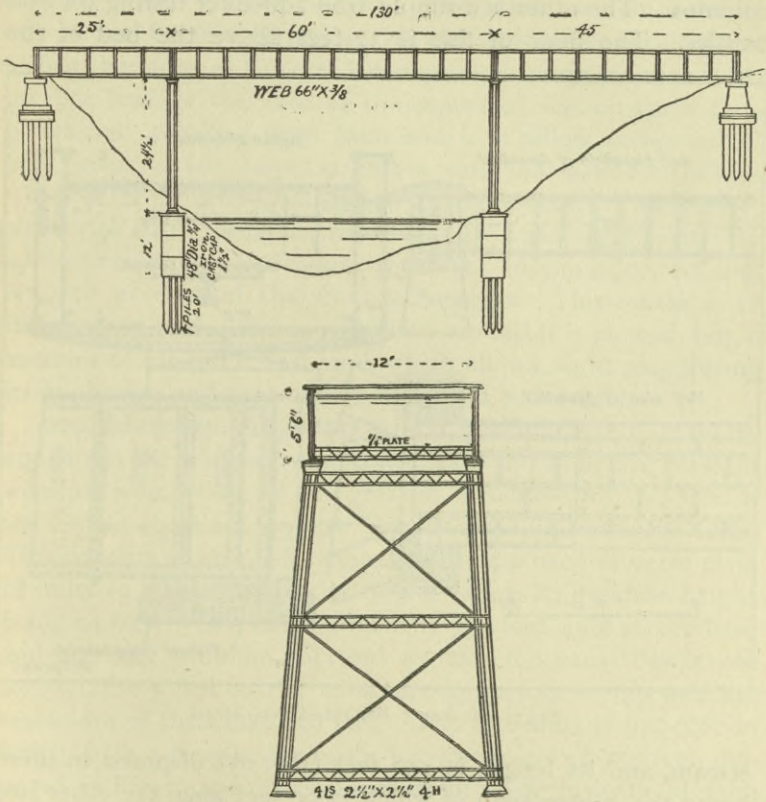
BEAR RIVER CANAL. ELEVATION AND CROSS-SECTION OF IRON FLUME ON CORINNE BRANCH.
